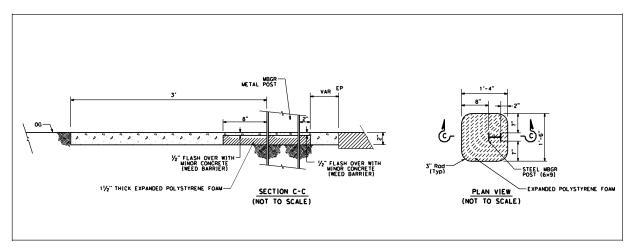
Test 659 Post Leave-out Plan and Cross Section
